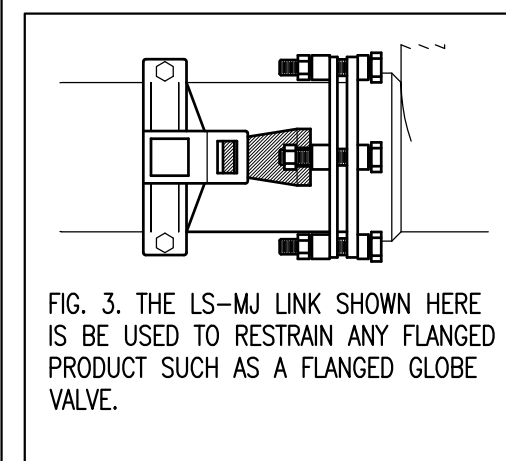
THE LS-MJ LINK SHOWN HERE IS BE USED TO RESTRAIN ANY FLANGED PRODUCT SUCH AS A FLANGED GLOBE VALVE.
